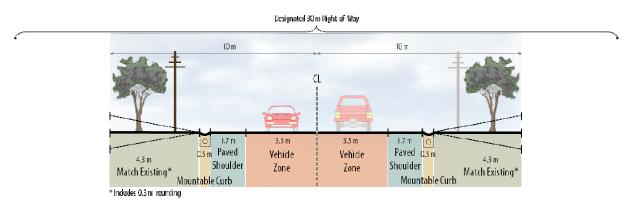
11.4 m Platform Semi-Rural Cross-Section for Mississauga Rd. / Old Main St.
